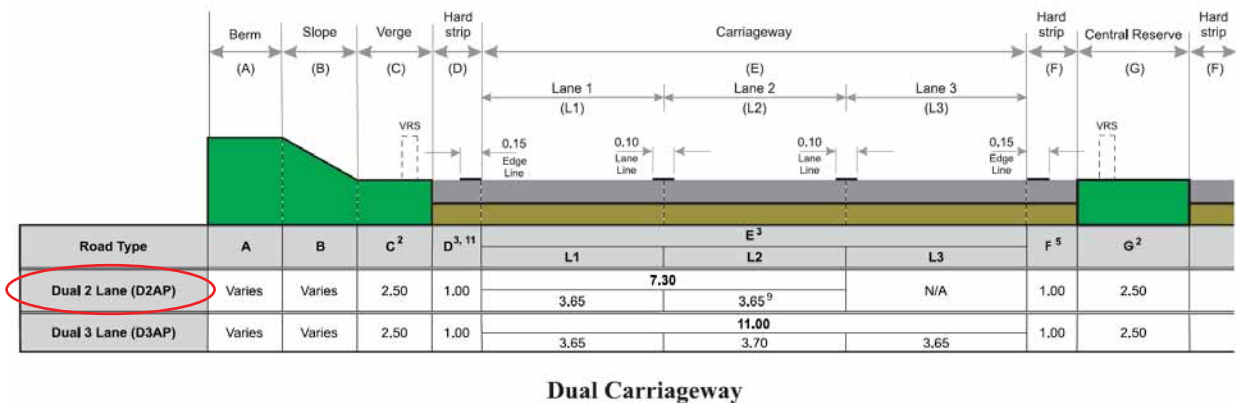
Highway Cross Sections (Source: DMRB Vol.6, Sect.1, TD27/05)
